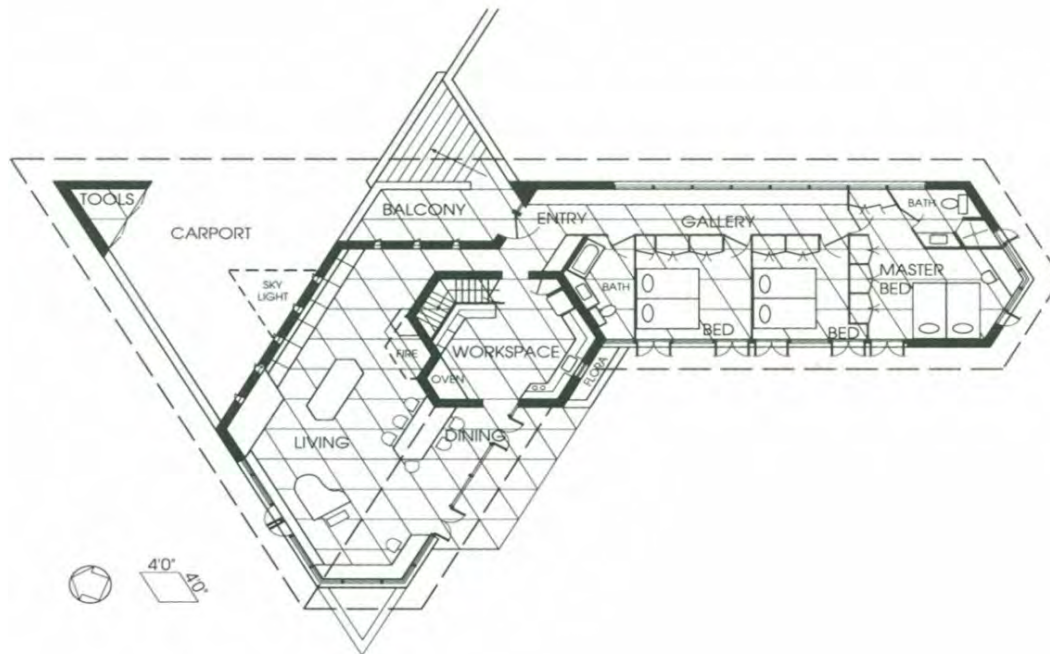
Olfelt House floor plan (Storrer, *The Frank Lloyd Wright Companion*, 436).
